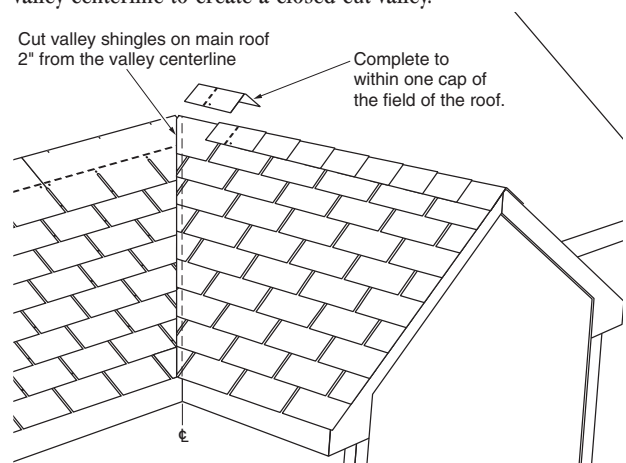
Dormer shingles extending across the valley with main roof shingles cut back two inches from the center line.
